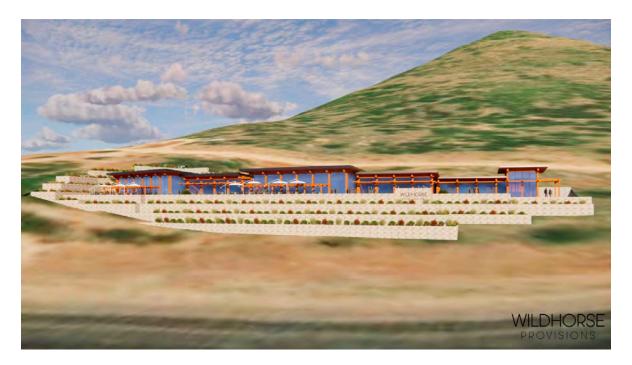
Exhibit A includes the full set of plans submitted by the Applicant on November 13, 2024
